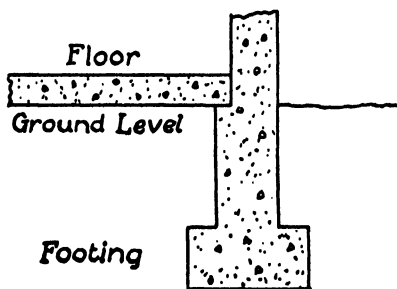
Diagram of the foundation and footing—necessary in the proper construction of any building.
